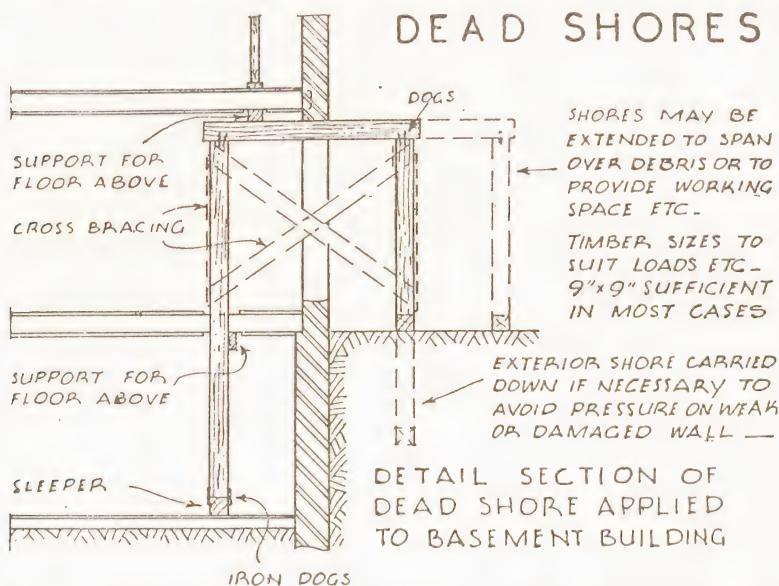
Cross section, showing dead shoring to wall in a basement building.
